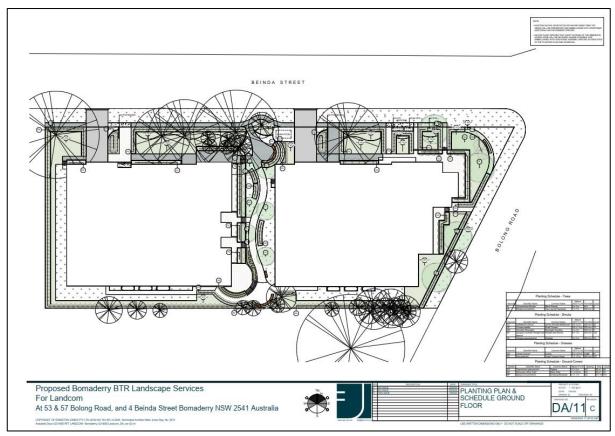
Planting Plan & Schedule – Ground Floor. (Source: Edmiston Jones)
